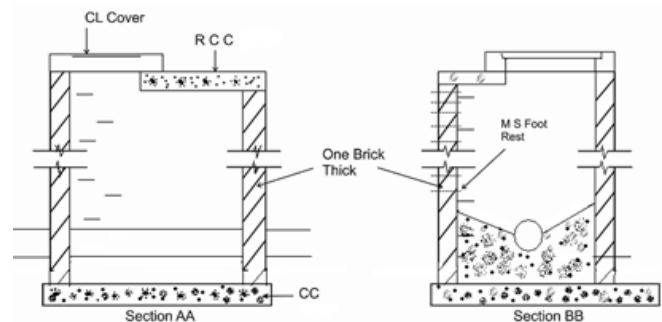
Rectangular manhole for depth 0.9 m to 2.5 m
